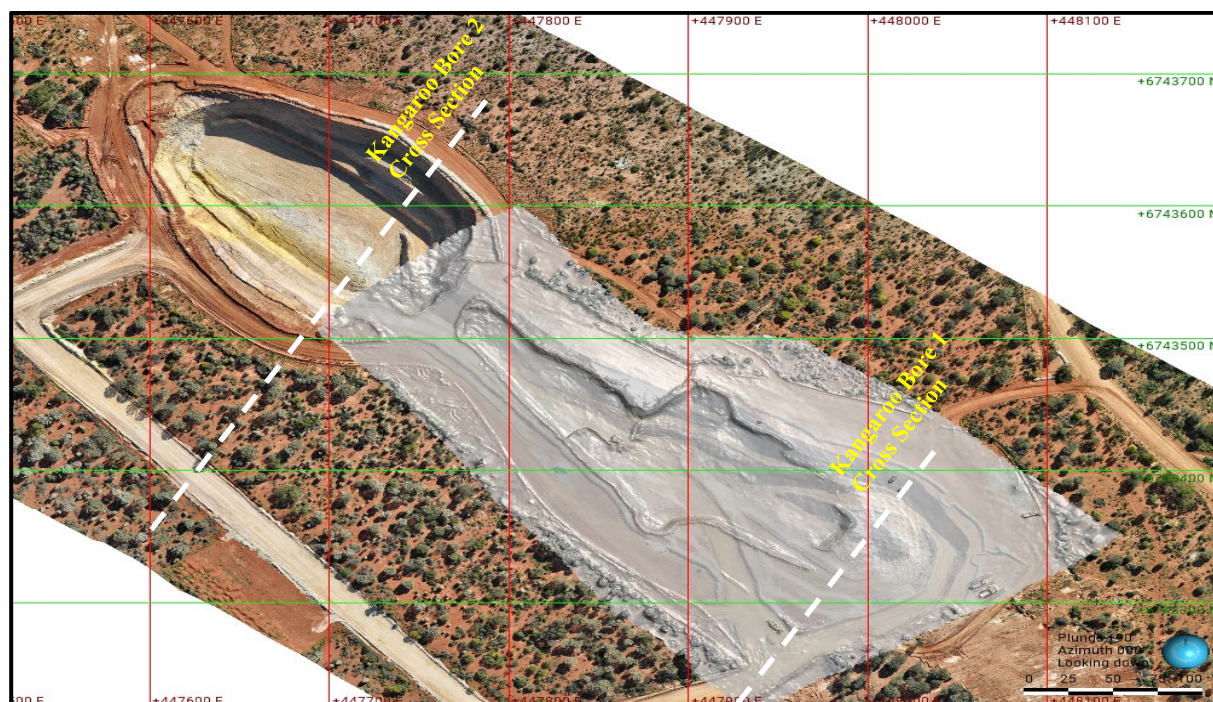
Plan section– Kangaroo Bore Pit showing section lines and March EOM surface and current Pit Orthophoto
